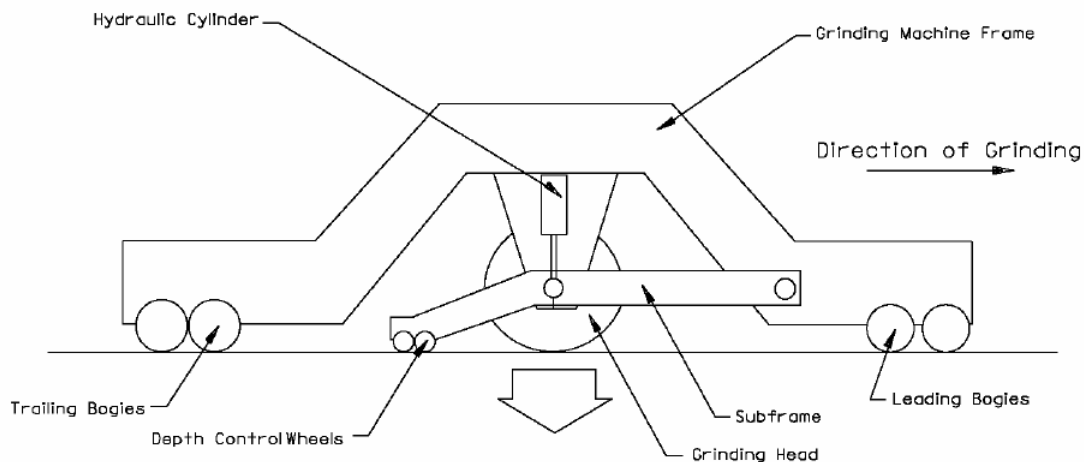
Schematic of grinding machine (MnDOT, 2005)
